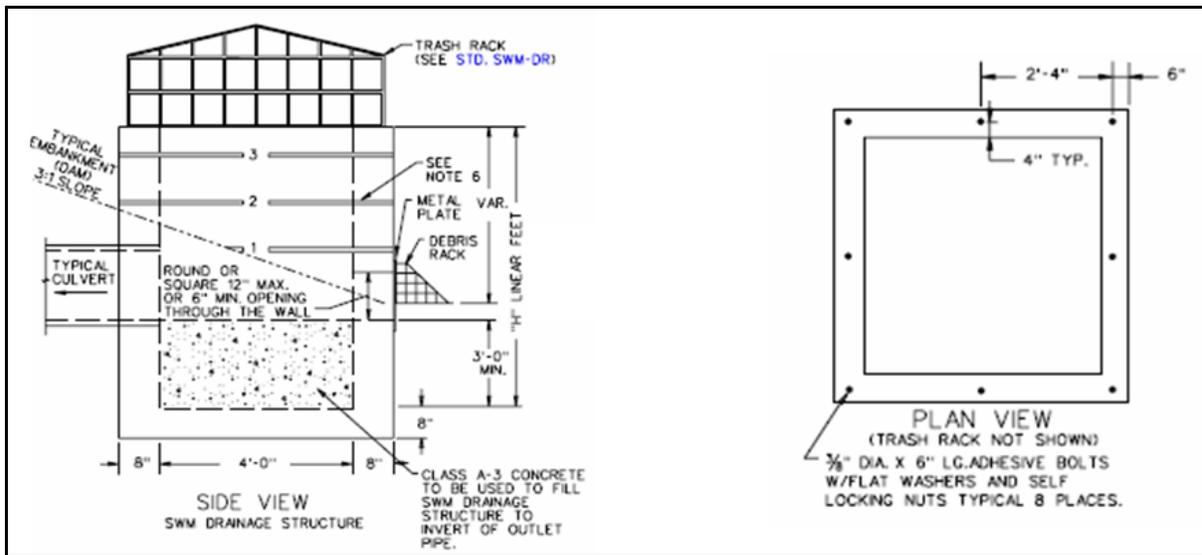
VDOT SWM-1 Plan and Section
